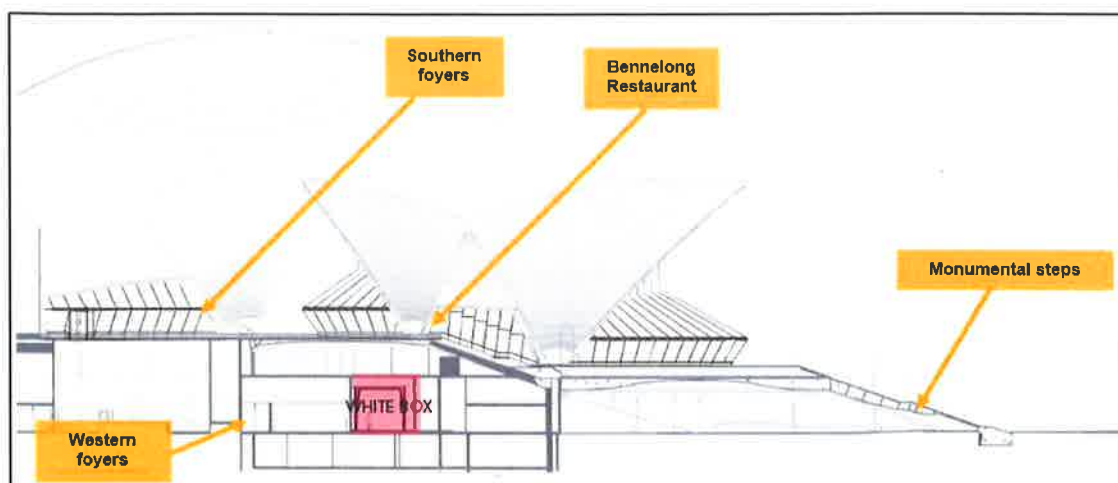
| Section drawing showing proposed works location (labelled by its project name, white box) (Base source: Architectural Drawings)
